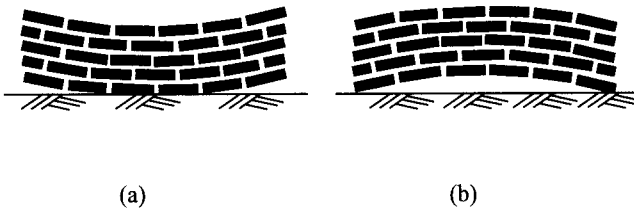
Failure patterns of unreinforced load bearing walls: (a) sagging and (b) hogging.
